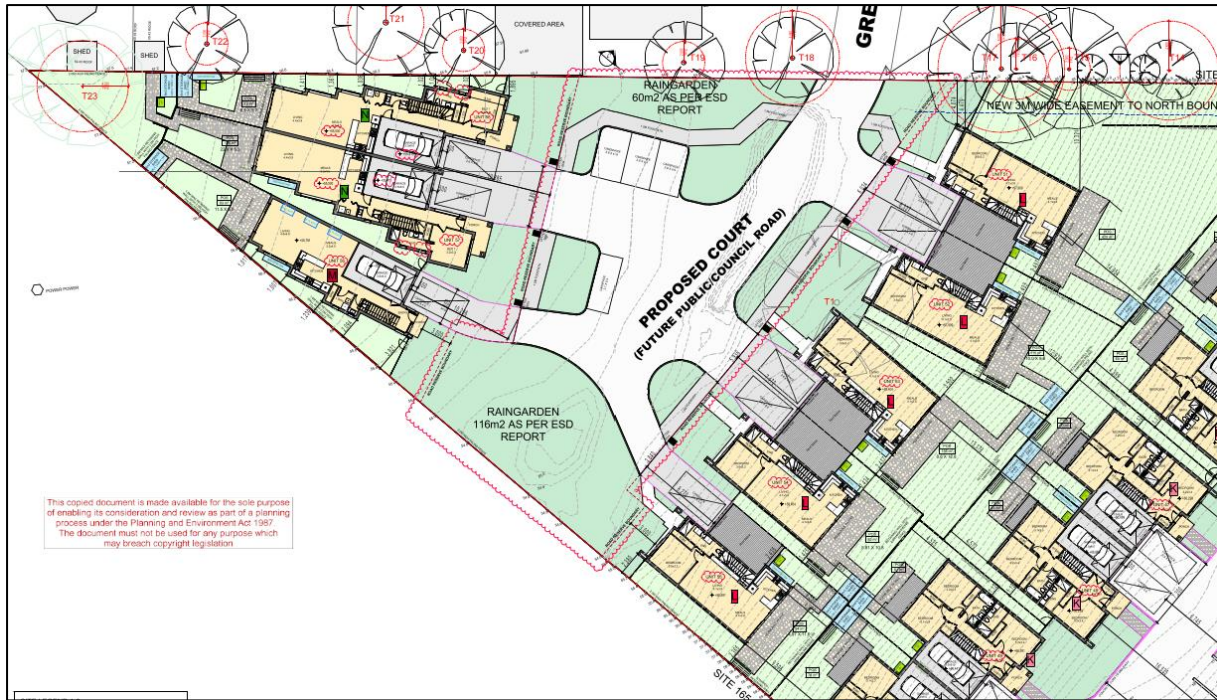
(above): Part site and floor layout plan of dwellings accessed from the lower entrance to the site from Greenway Court. Source: Application documents.
